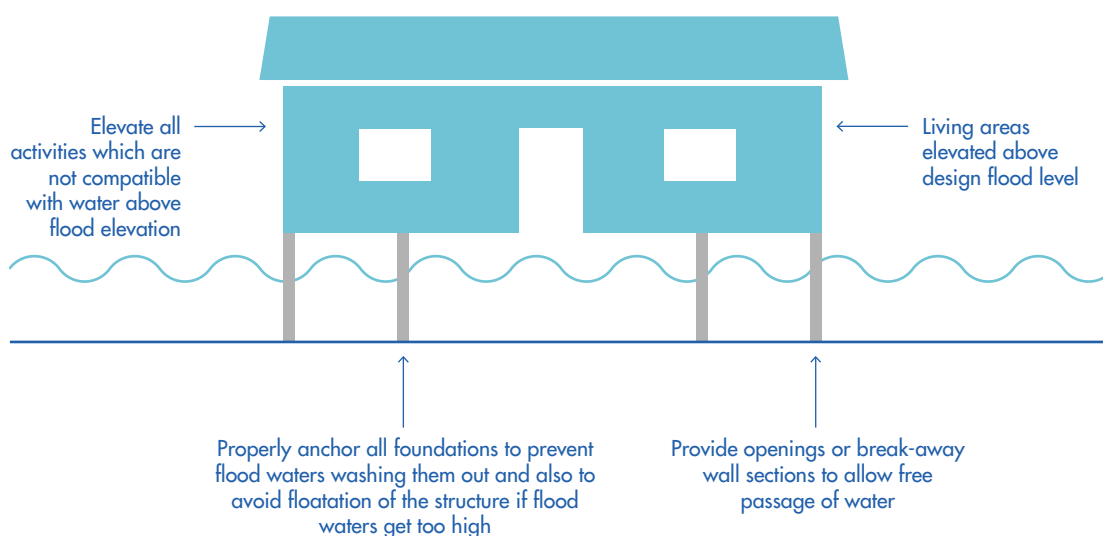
Basic wet flood-proofing measures for a residential structure (Source: Redrawn by the authors).
